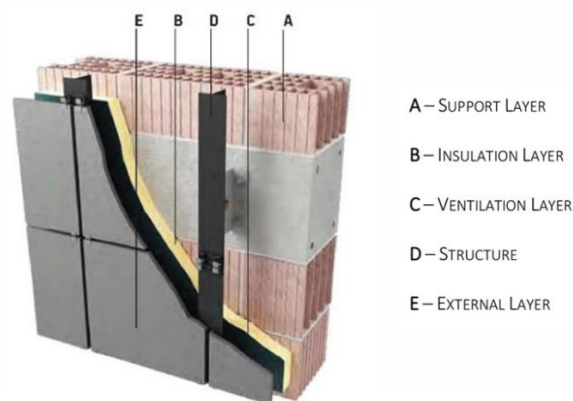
Schematic Example of Ventilated Façade [17]
